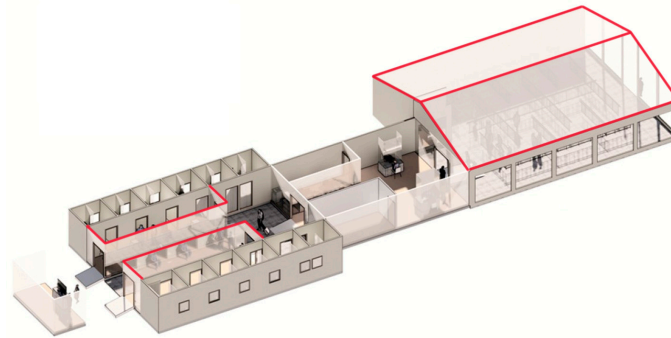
COVID-19 departure test center: axonometric view with additional constructions (marked with a red line). (Source: authors, 2022).
